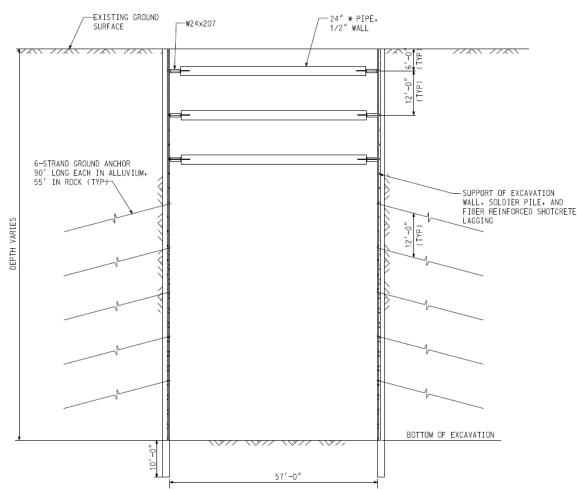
Section of Typical LRT Station Support of Excavation
